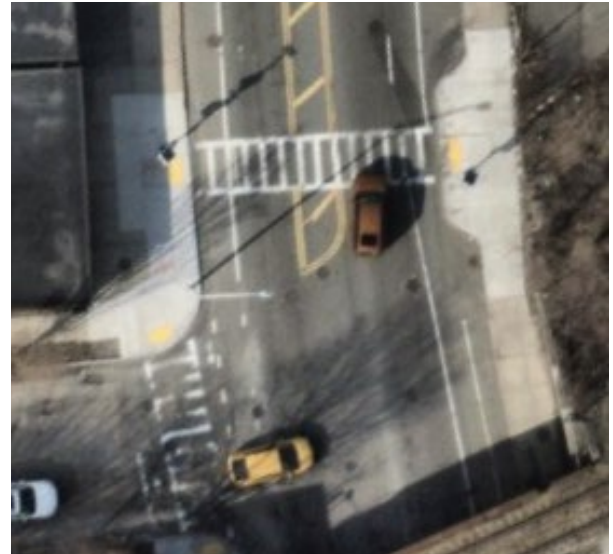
New curb extension at the intersection of Southbridge Street and Southgate Street (Nearmap).
